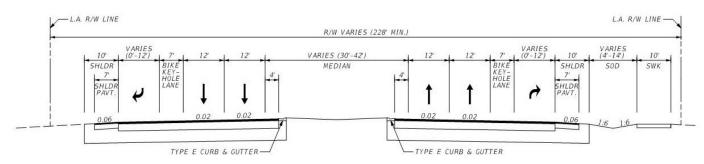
Proposed Typical Section - CR 714 / SR 714 / Martin Highway below I-95
